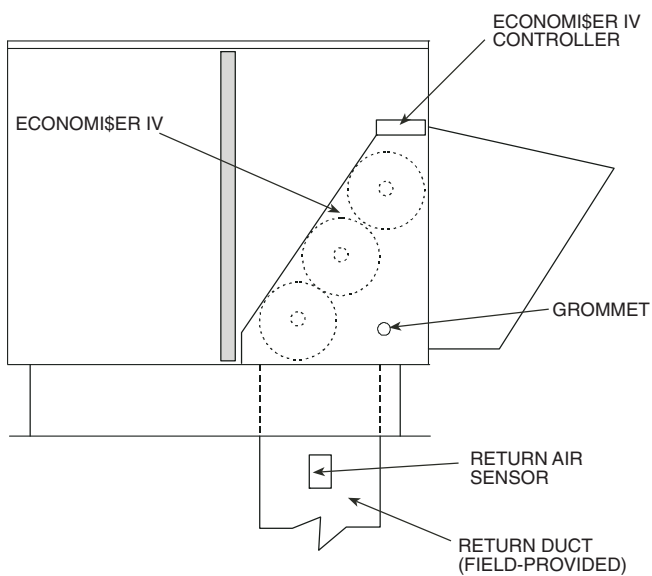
Return Air Enthalpy Sensor Mounting Location
